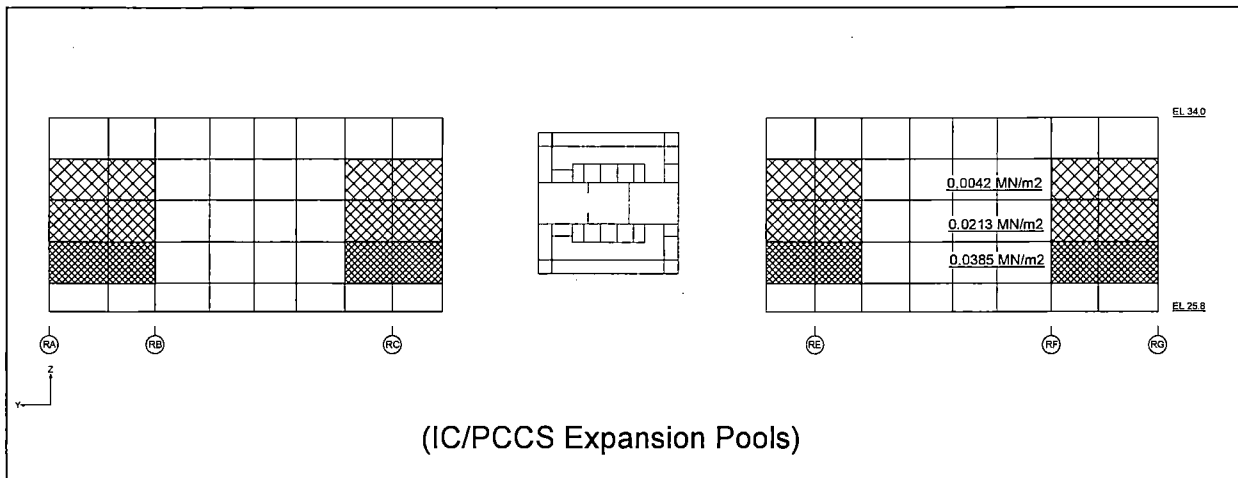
Hydrostatic Loads on the Inner Wall at EL 27,000 (R2)
